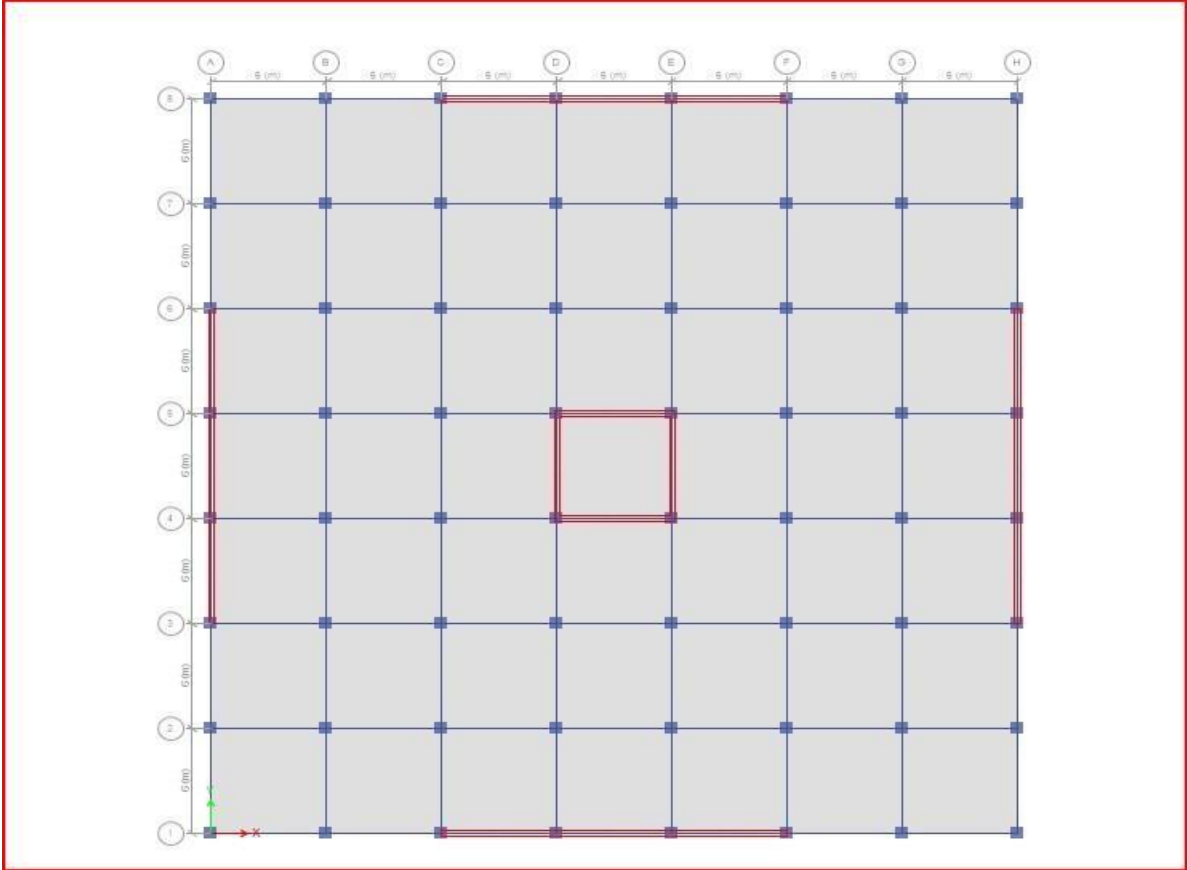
plan view of Soft Story model with horizontal stiffeners
